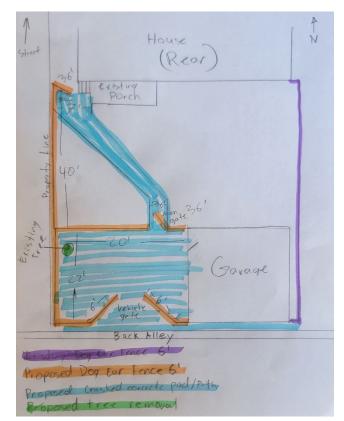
, by Applicant: Proposed installation of the gravel pad and walkway, fence, and tree removal.
